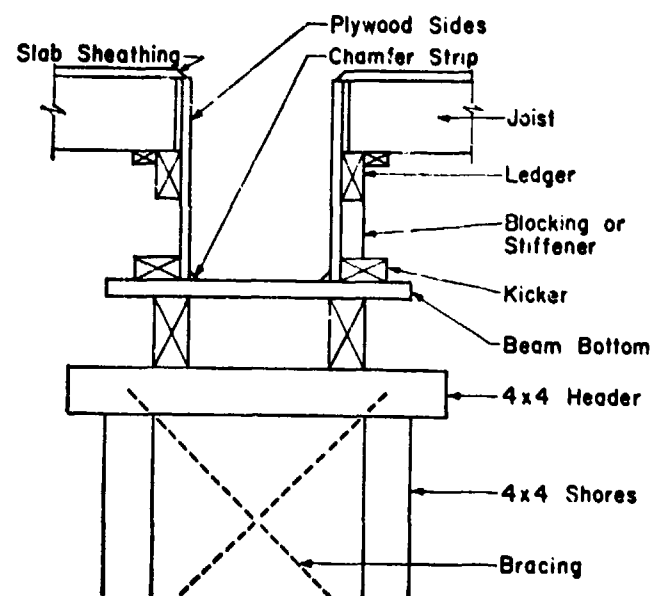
Beam form detail with extended bottom and resting on double 4 by 4 shores (Courtesy of American Concrete Institute)
